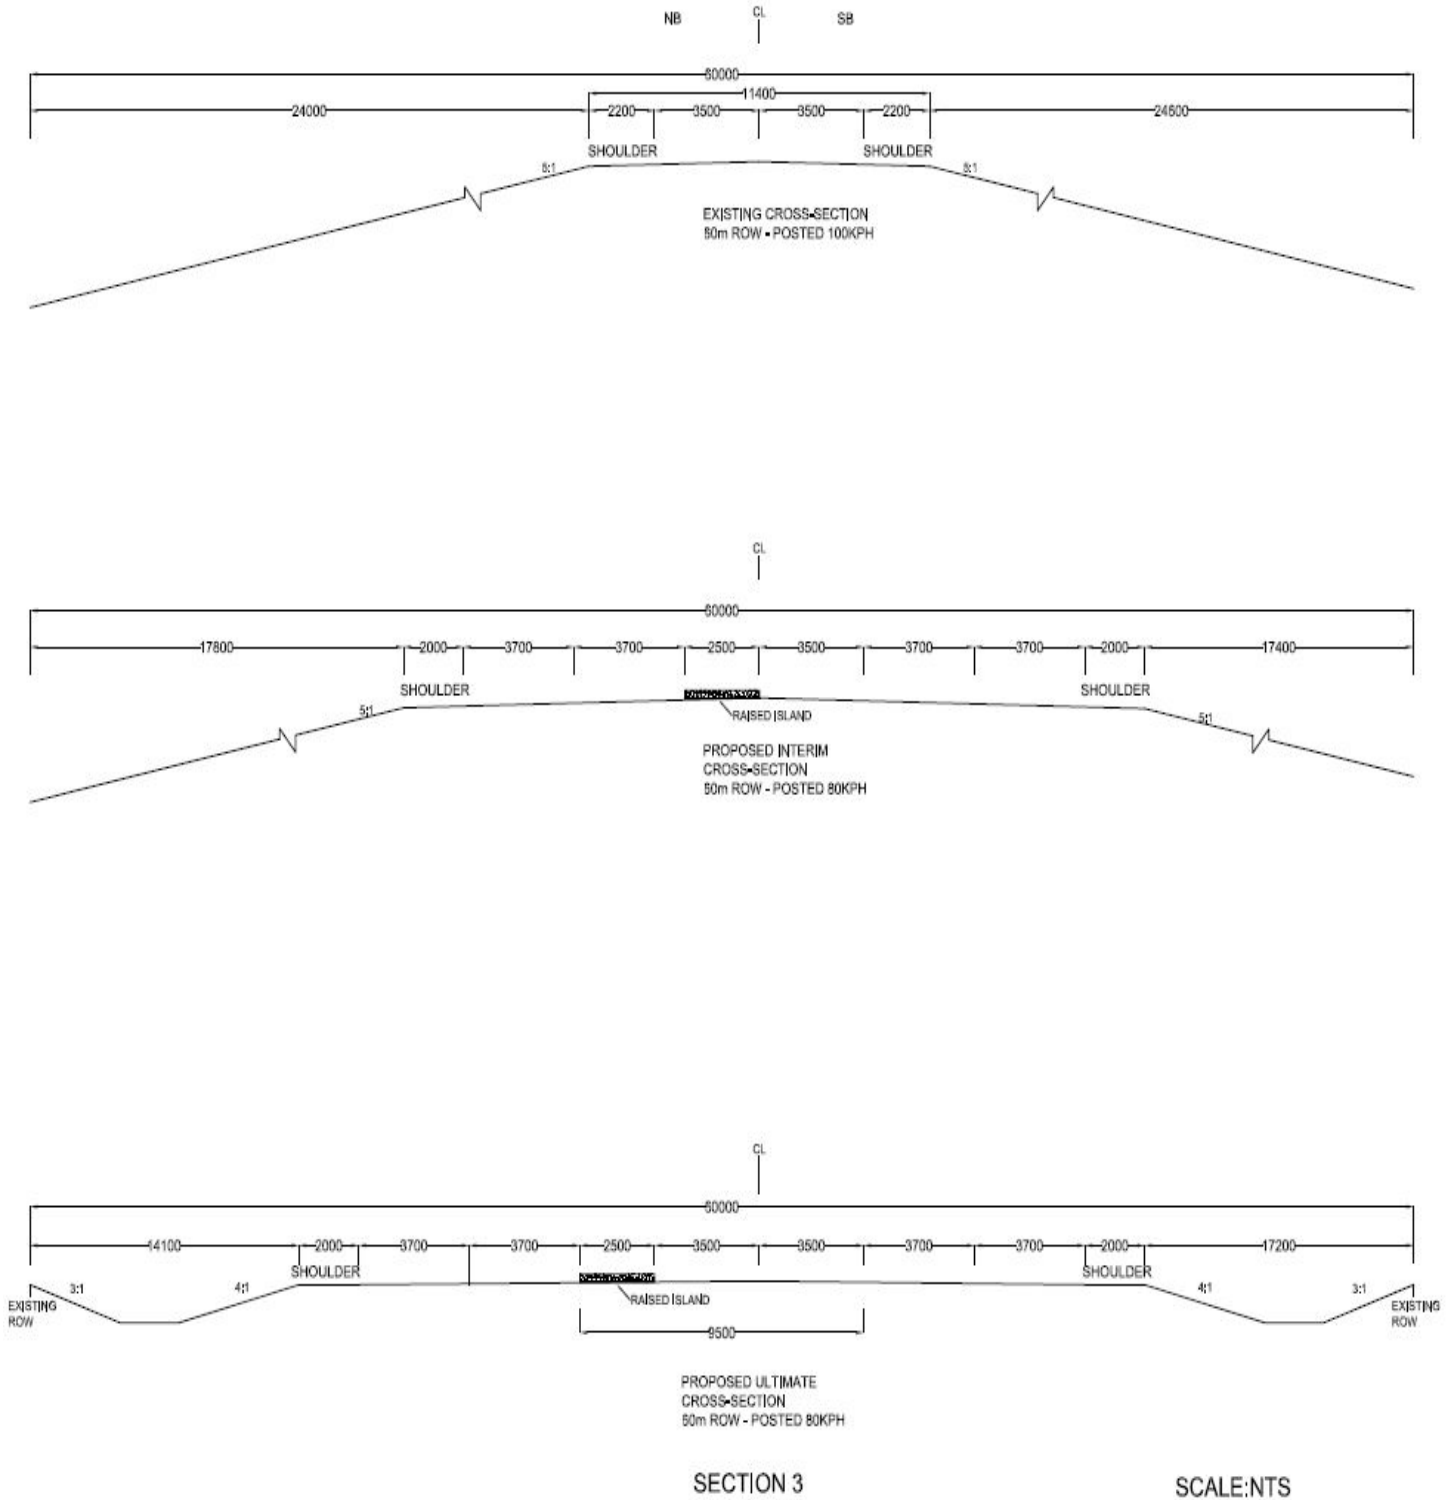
Proposed Section 3 – Hwy 7 at 6th St East
